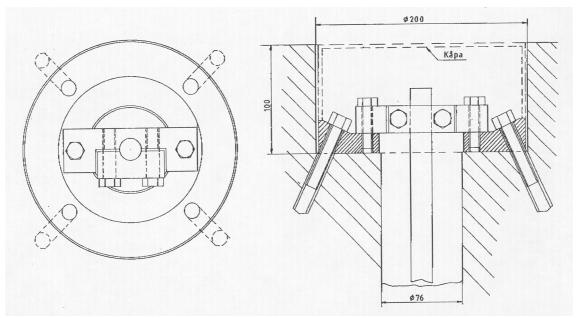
Borehole enlargement with anchorage for borehole equipment.
